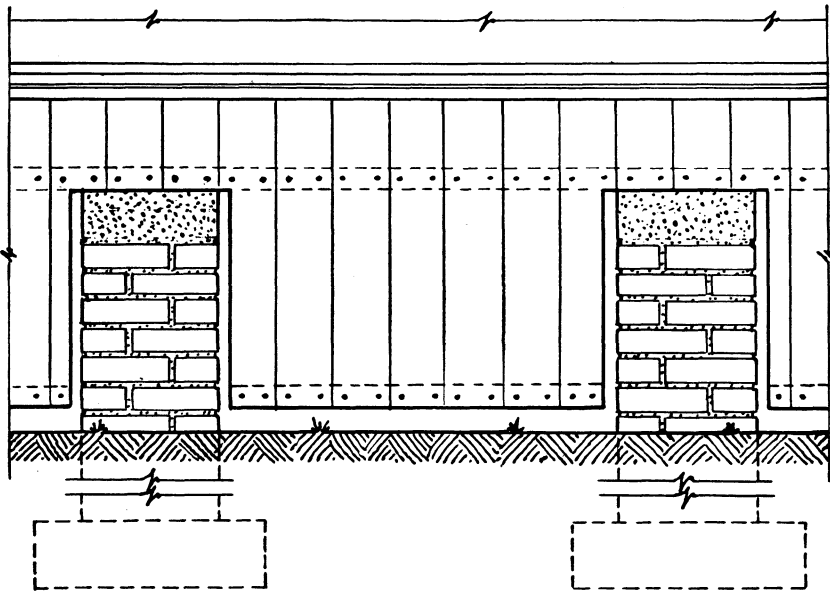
Wooden skirting between piers with a minimum side clearance of 1 inch and ground clearance of 2 inches to prevent attack by termites and decay. Note concrete cap on brick pier to force termites into the open and prevent hidden infestation. Inspections will reveal tubes which can be destroyed, and the soil can be poisoned if necessary.
